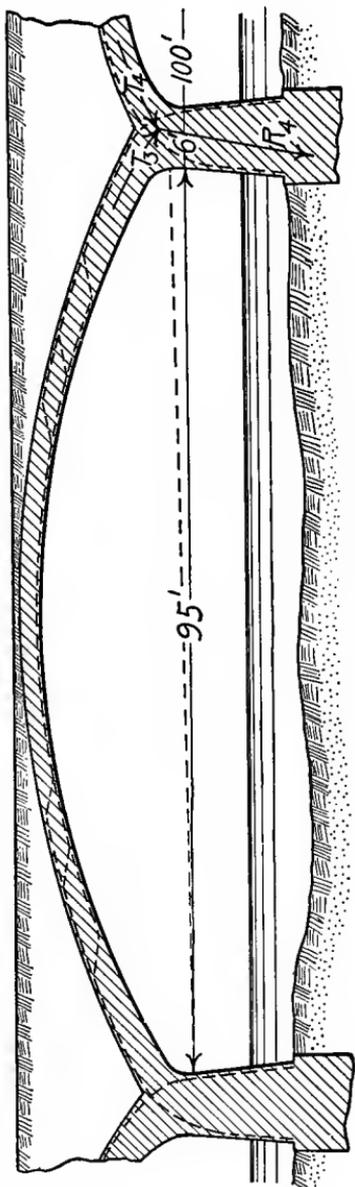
HIGHWAY BRIDGE OVER WABASH RIVER, PERU, IND.
